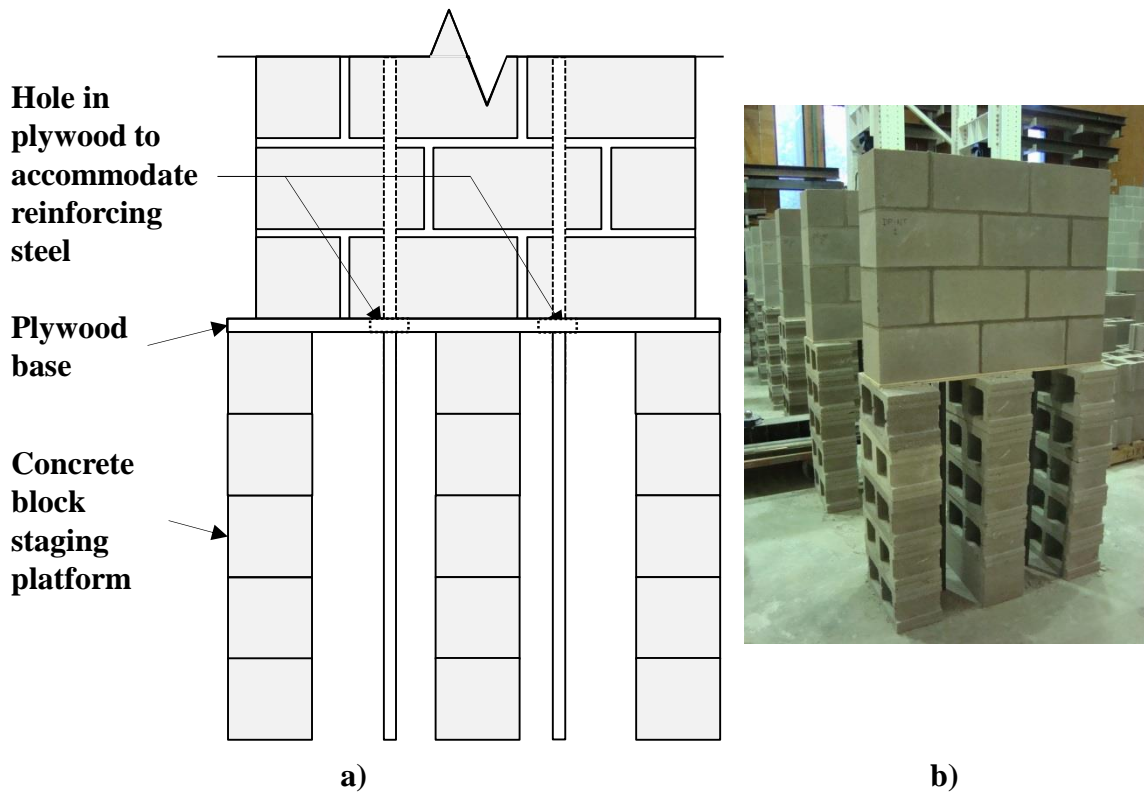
Double pullout specimen bases: a) illustration, and b) as-built photo
